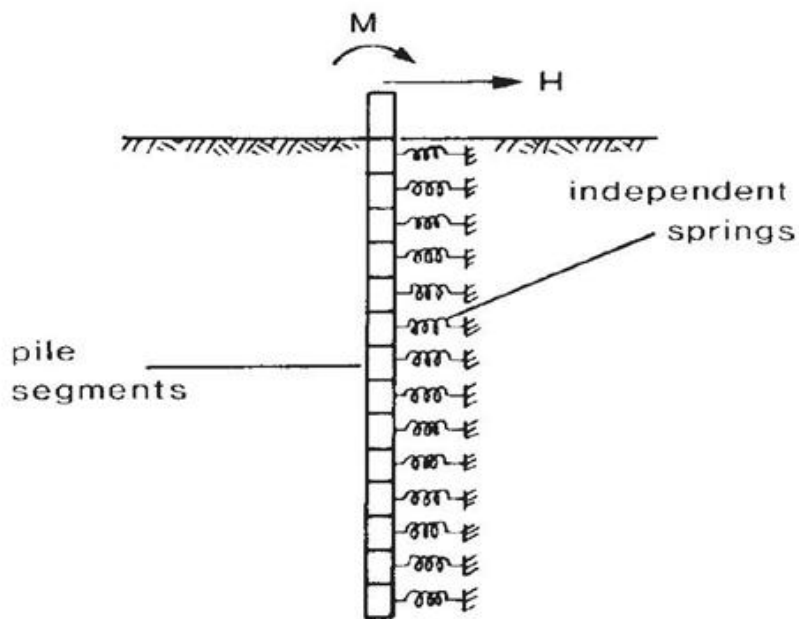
Subgrade reaction model of soil around based on pile Winkler's idealization of a beam on elastic foundation
